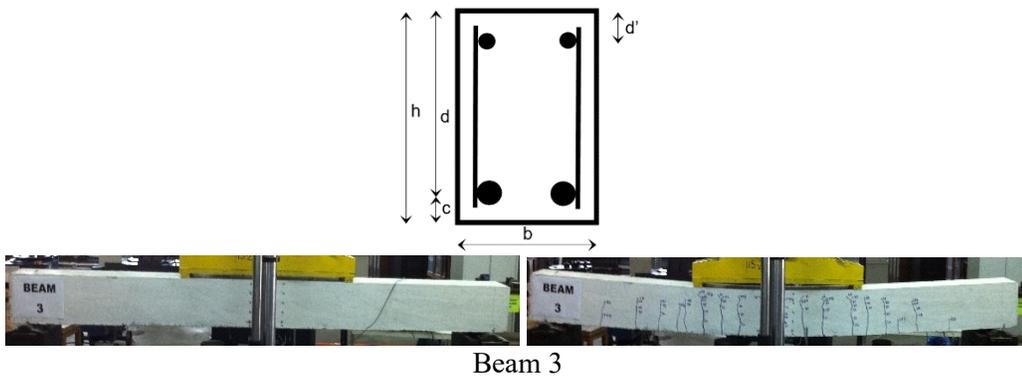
, Beam 3: NSM concept shear reinforcement bars [27]
